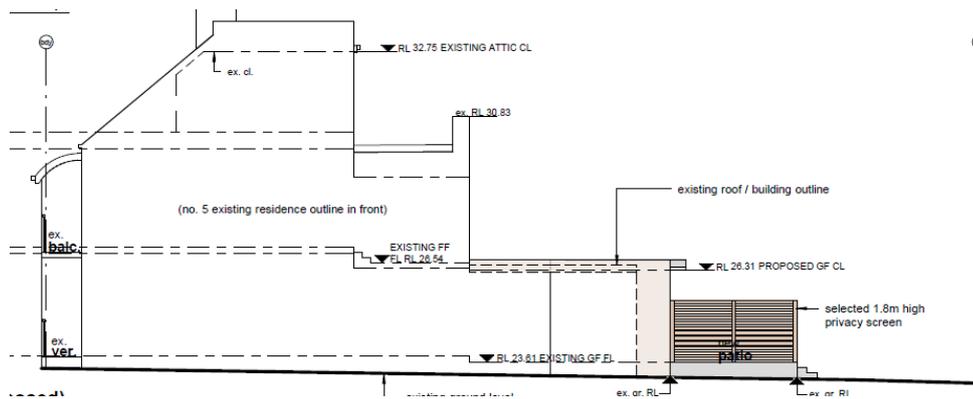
Proposed north-western elevation – 3 Oswald Street Randwick (Source: John Spiteri Design and Drafting)
